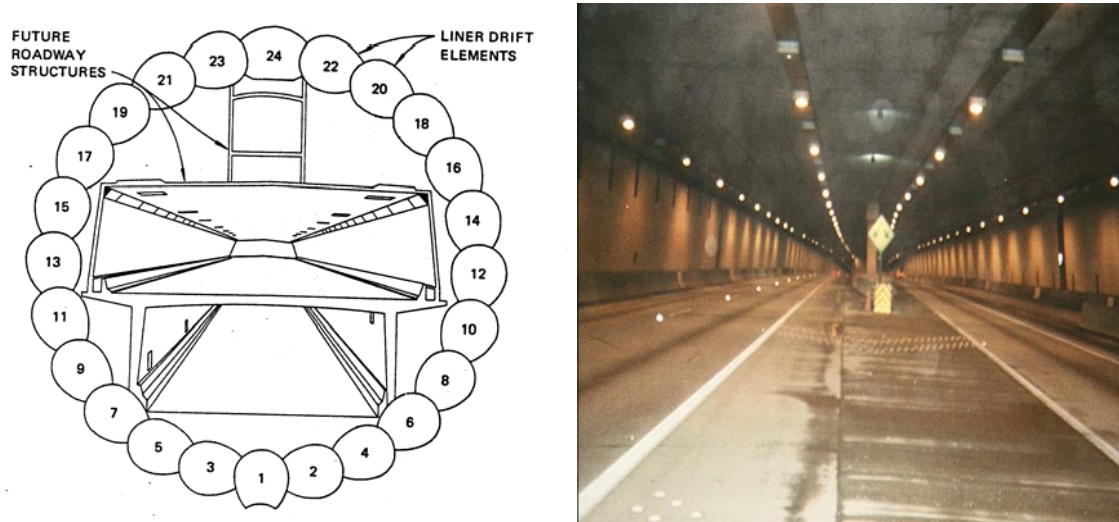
Stacked Drift and Final Mt Baker Tunnel, I-90, Seattle, WA
